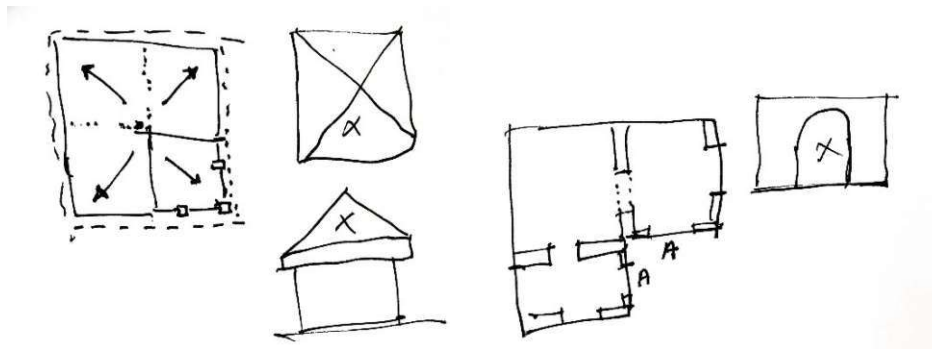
Diagram of a Shemiran traditional house, its plan, roof and elevation
